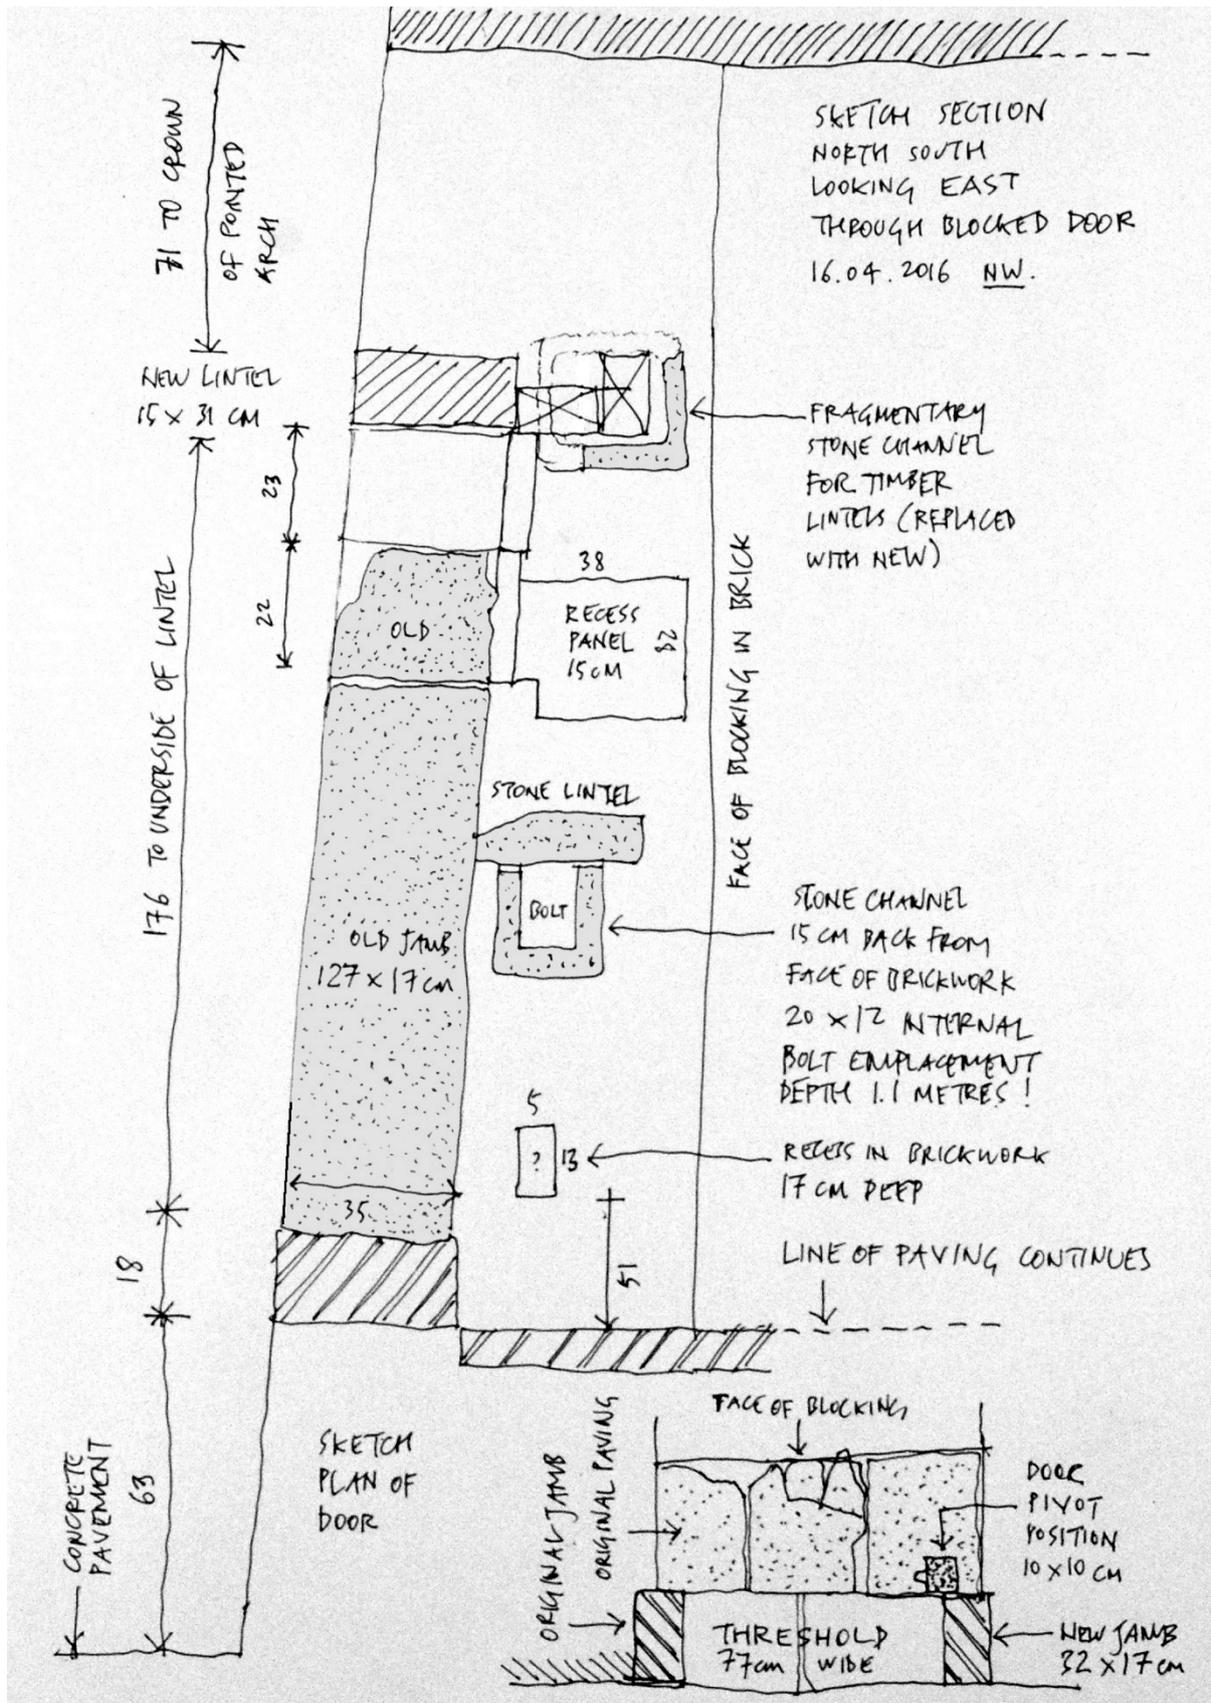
Sketch section and plan through west door looking east showing original features
